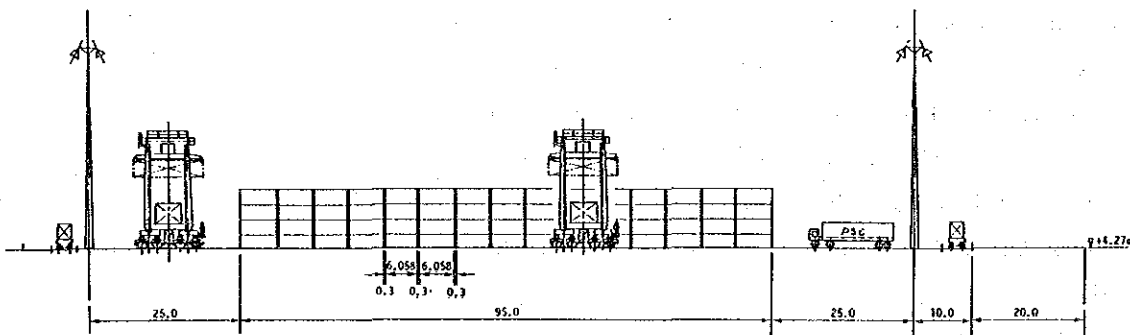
A Cross Section of No.3 Container Berth (Unit: m)
